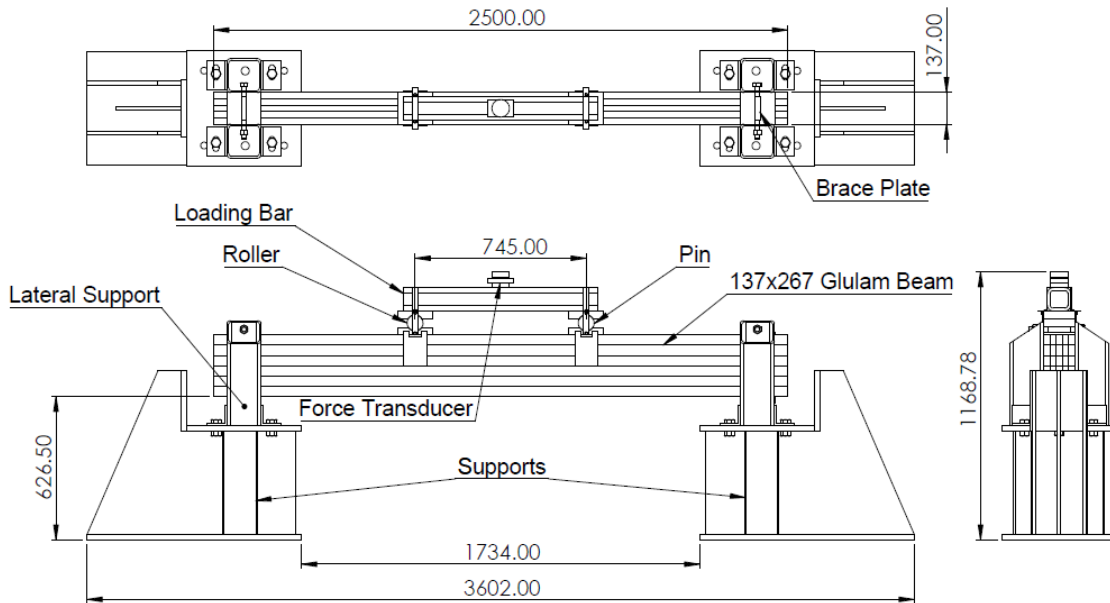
Sketch of dynamic specimen reaction frame and loading beam
